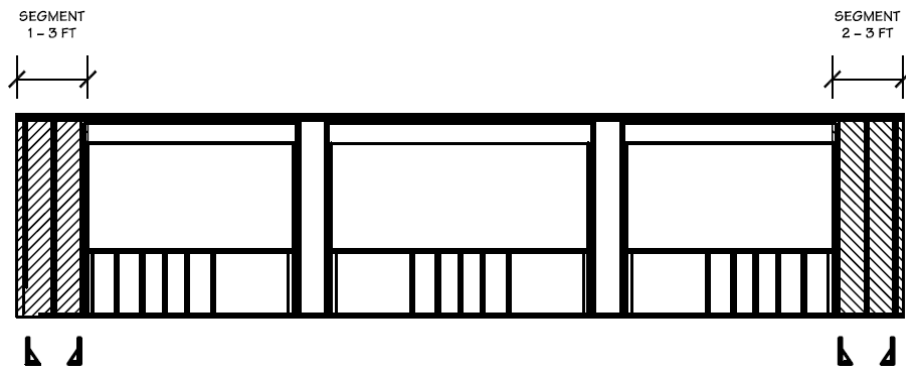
Design drawings of archetype buildings, model # 1, commercial 2 x 8.5 ft (Filiatrault, 2007)
